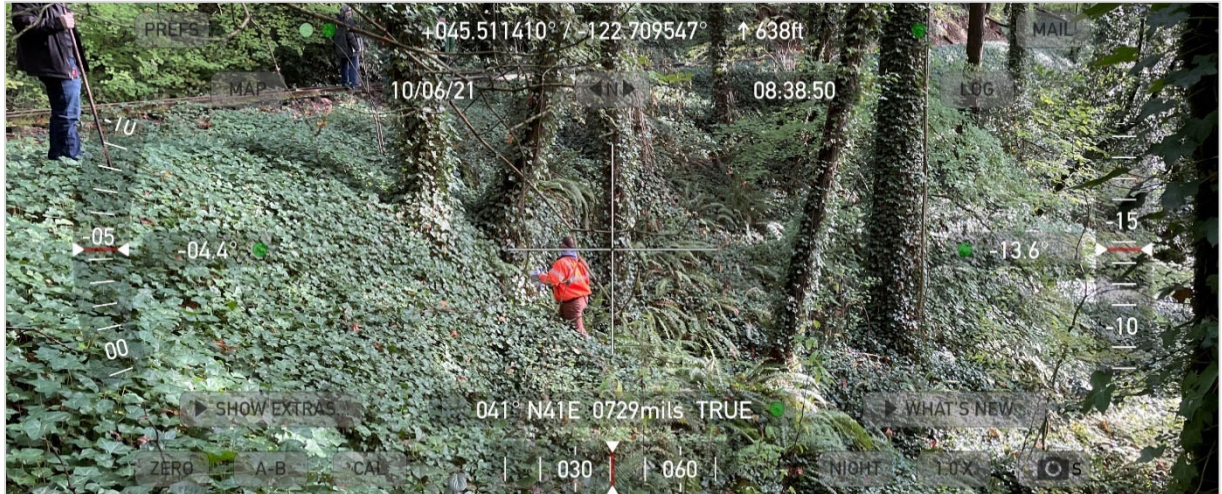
Trees and underbrush growing over existing crib wall 1
